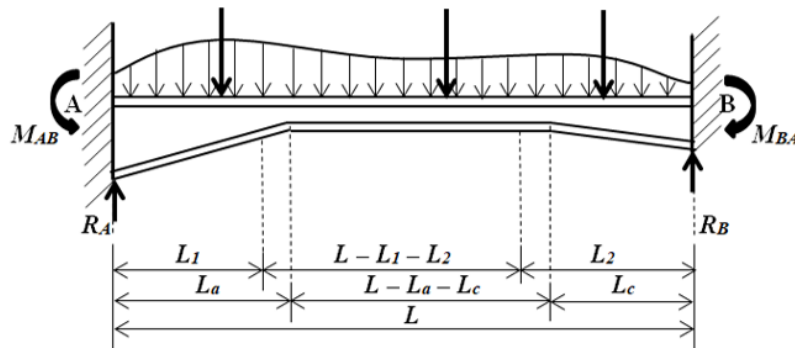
Any type of load for I-section steel beams with straight haunches
